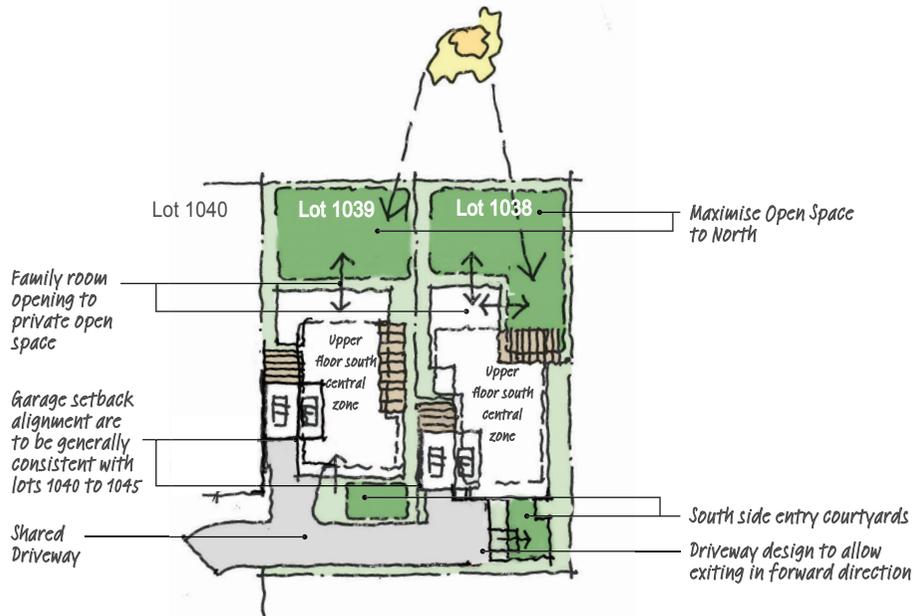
Potential site planning arrangement for Lots 1038 and 1039
